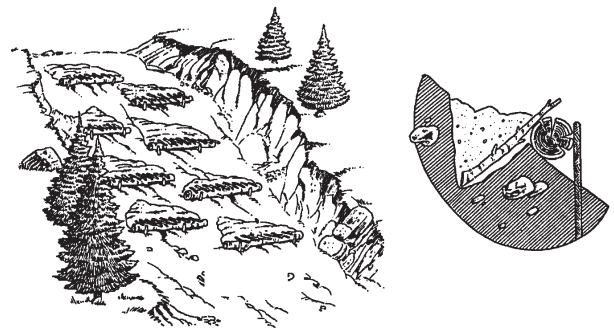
Modified brush layers can be built with either a log or a board for support. They should be staggered across a slope so that material rolling down the slope does not have a chance to accelerate before it is caught. The section shows the normal backfill which creates a small bench (after: Polster, 1997).
